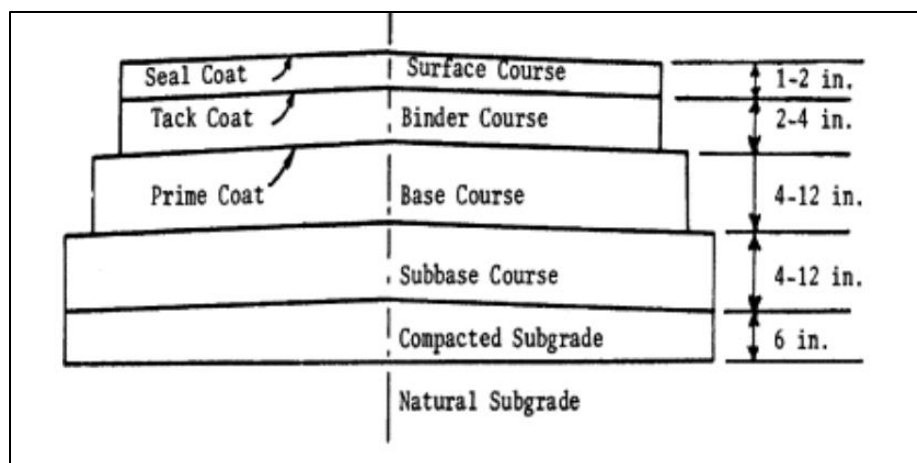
Typical cross-section of a granular pavement (Saltan & Findik, 2008).
